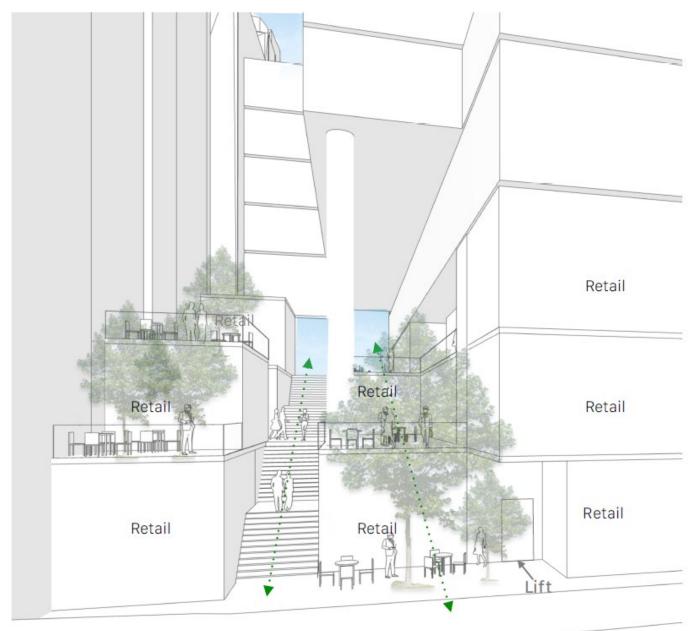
XX – Through-site link at Sussex Street elevation – indicative
